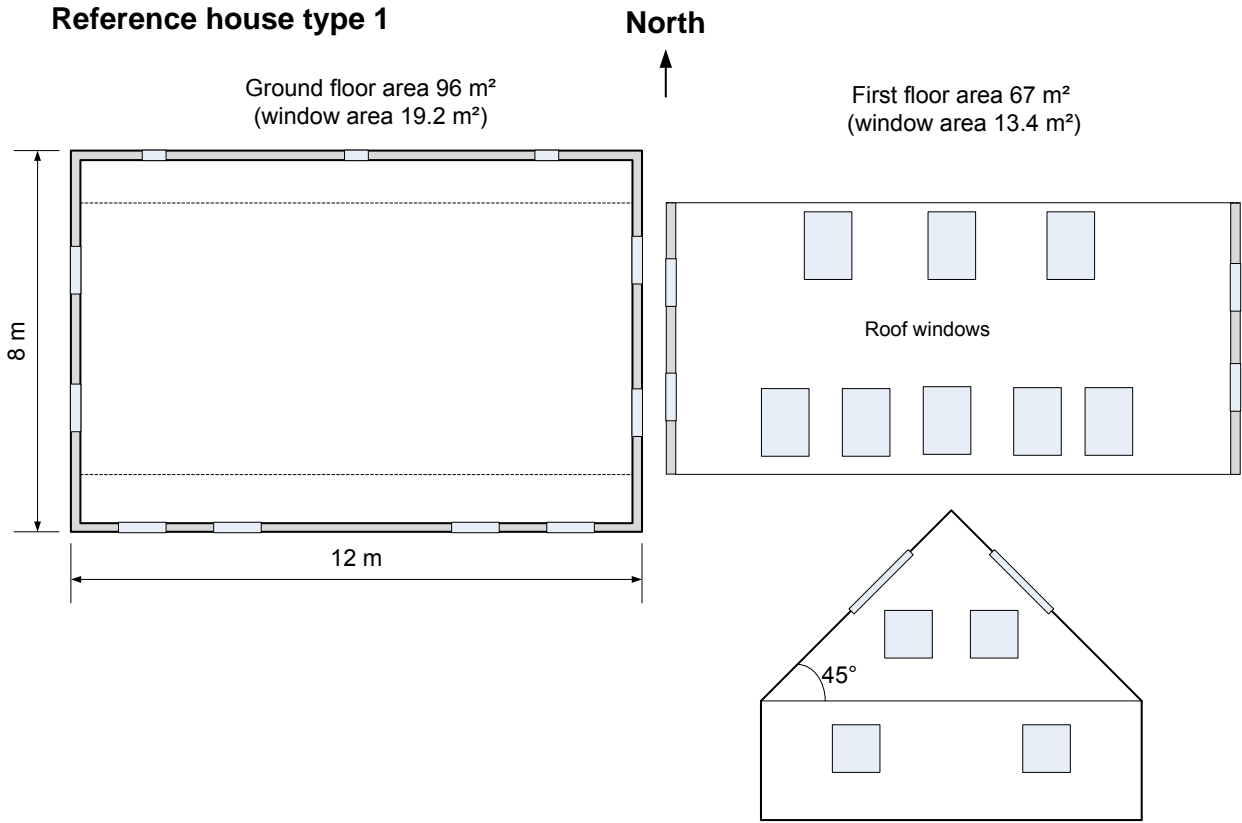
Outline of the reference house type 1 with 45° sloped roof construction
